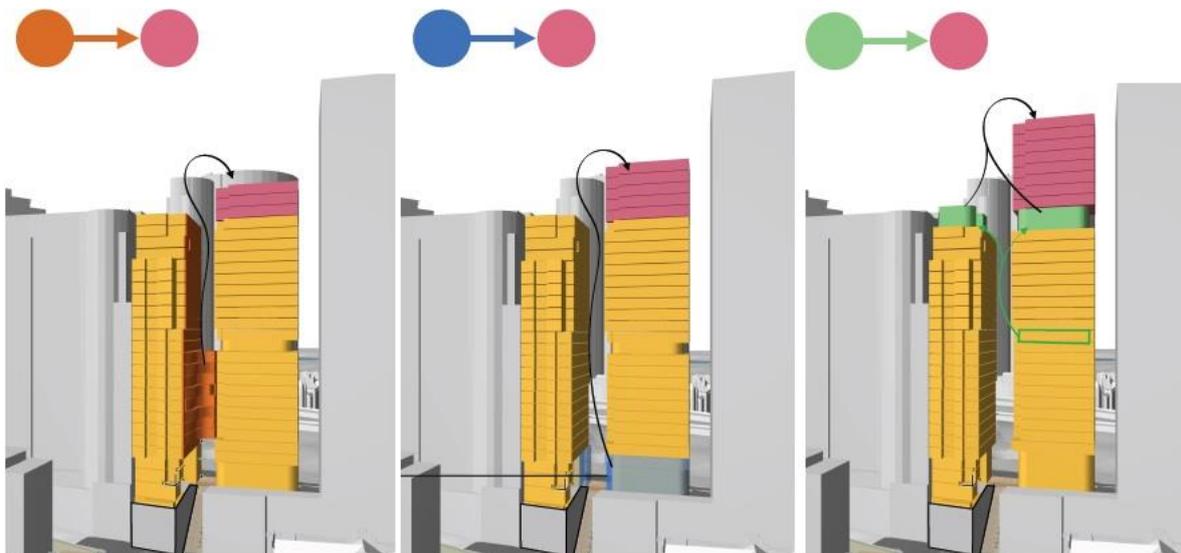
Extract from the 'Architectural Design Report' (FJMT) showing the redistribution of massing from the connecting link between the towers, the ground plane and relocation of communal spaces
